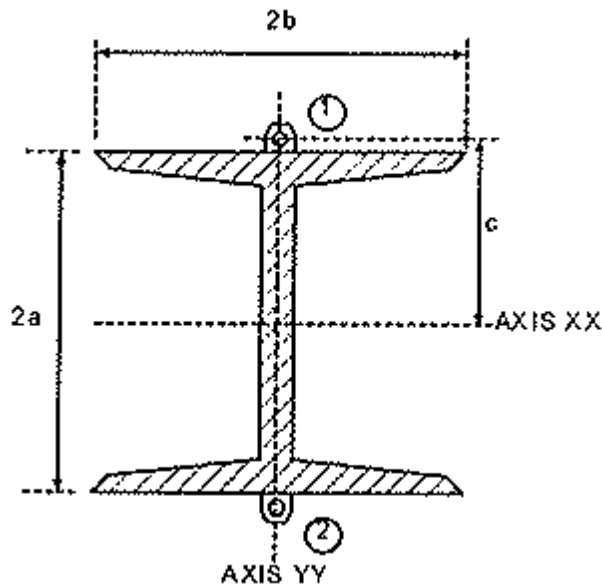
STRAIN GAUGES MOUNTED ON FLANGES (NOT RECOMMENDED)
